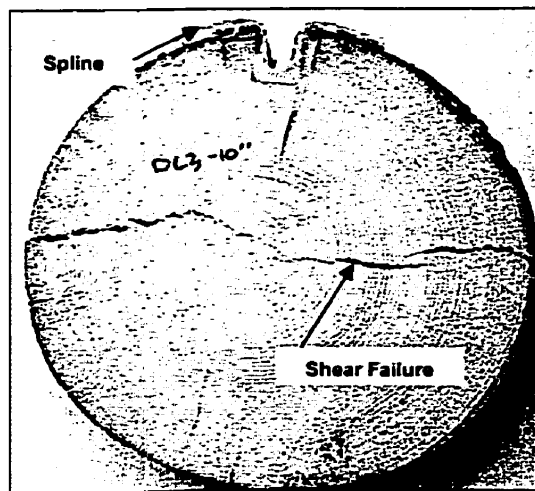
Typical cross-section failure of Phase II specimens.
